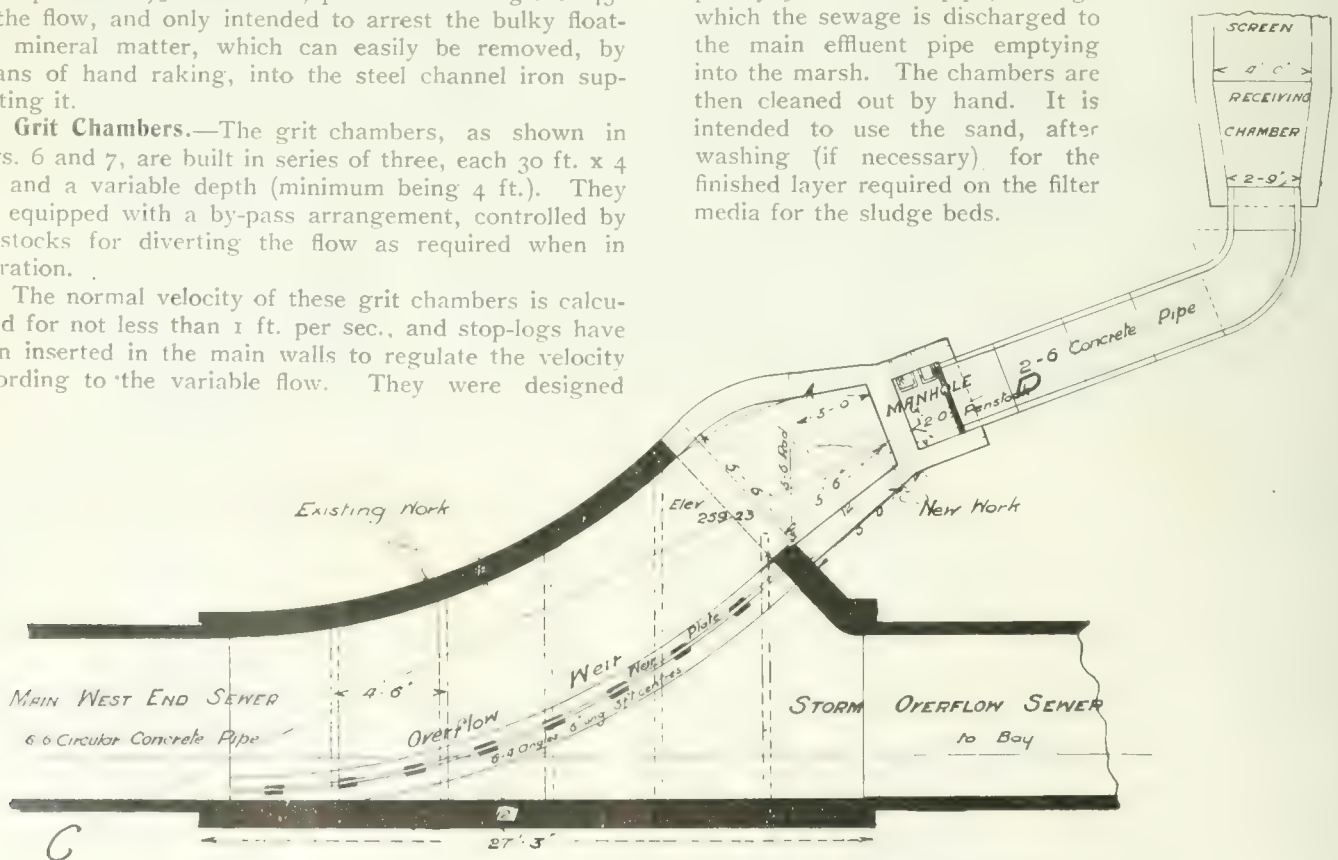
Plan of Overflow Chamber and Connection to Tanks from Main Sewer.
